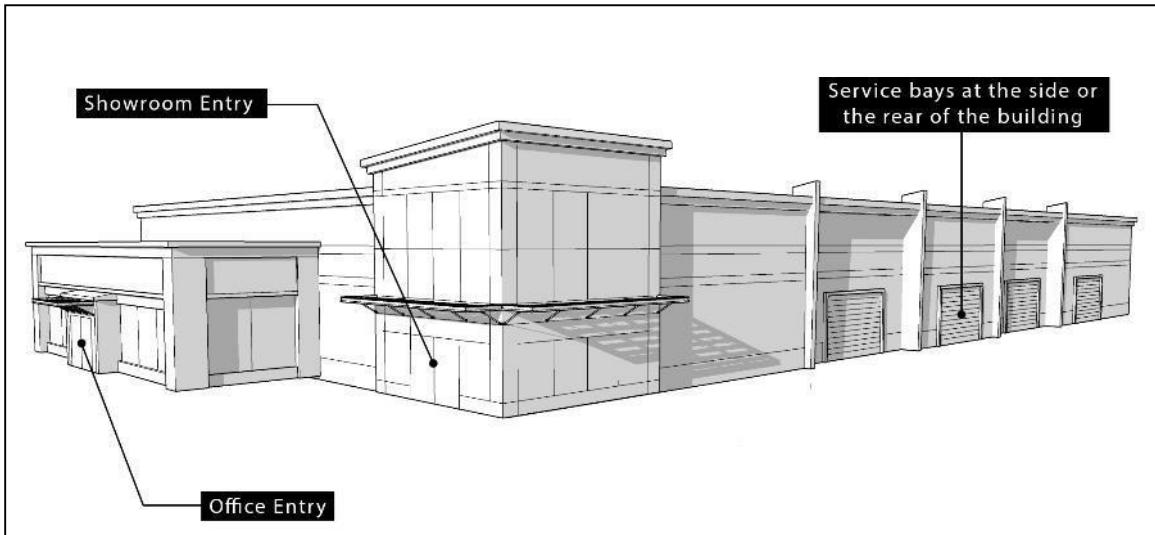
Industrial building with office and showroom differentiated from the warehouse and loading docks.
